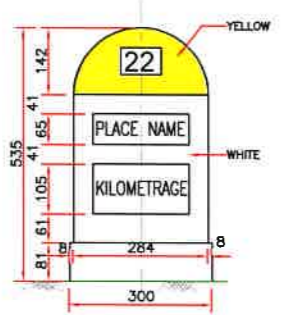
DETAIL OF FIFTH KILOMETRE STONE (SCALE 1:20)
